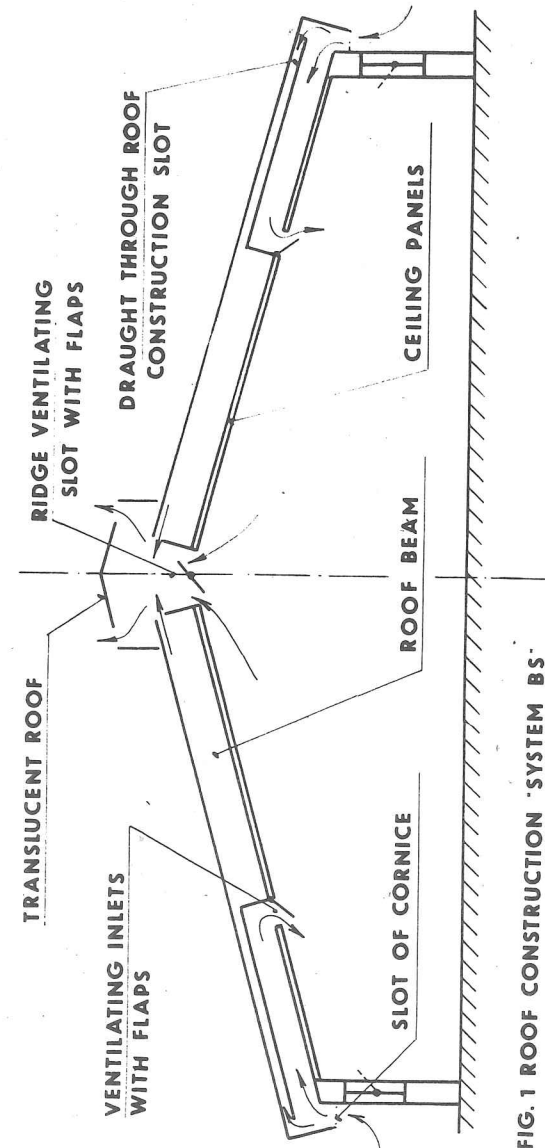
ROOF CONSTRUCTION 'SYSTEM BS'
